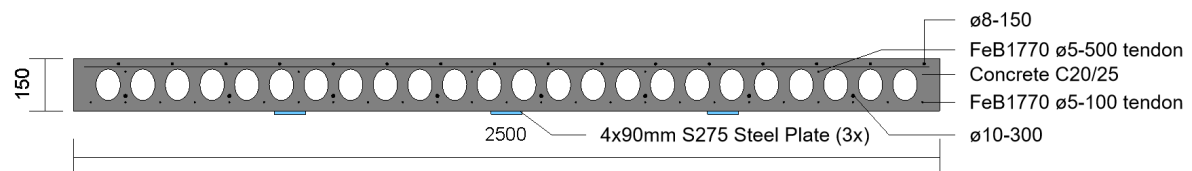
Hollow Core Slab With Intervention Technique Steel Plate Bonding Side View
